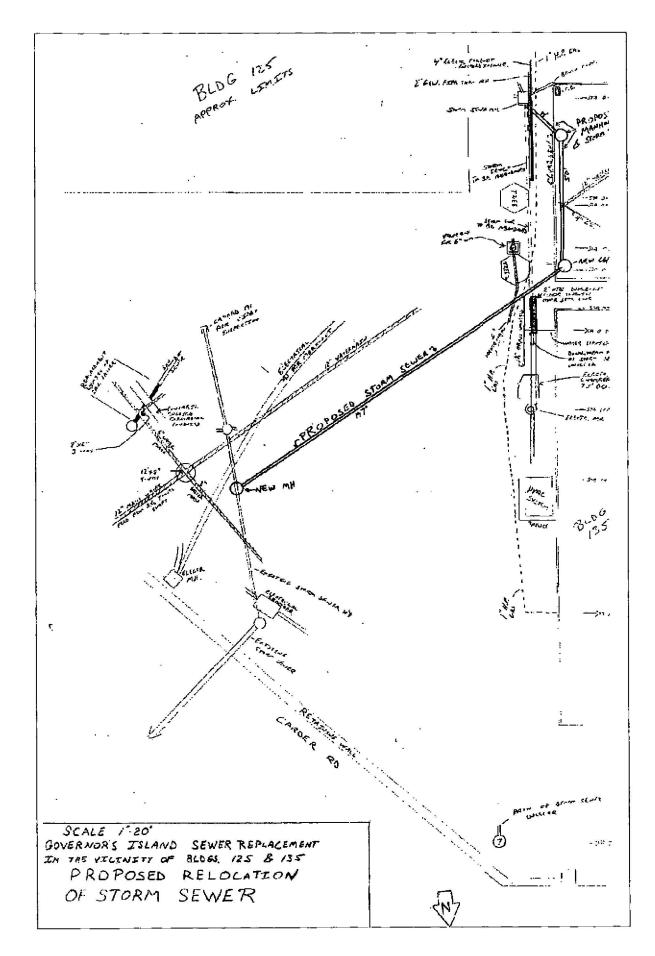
Proposed storm sewer relocation at Governors Island around Buildings 125 & 135.
